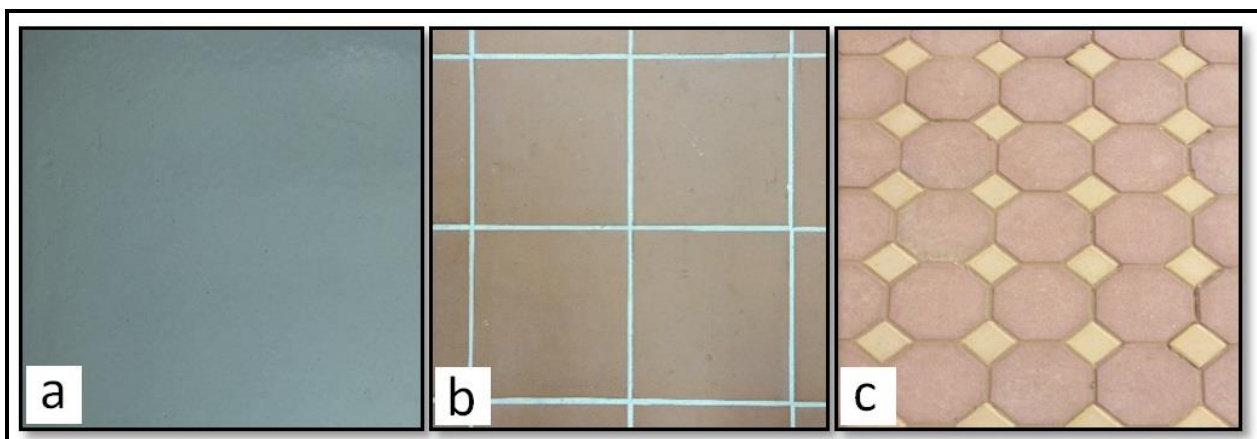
Other used building materials: a) Rubber sheet covering the concrete floor, b) Unglazed pottery tiles, c) Prefabricated colored concrete tiles.
